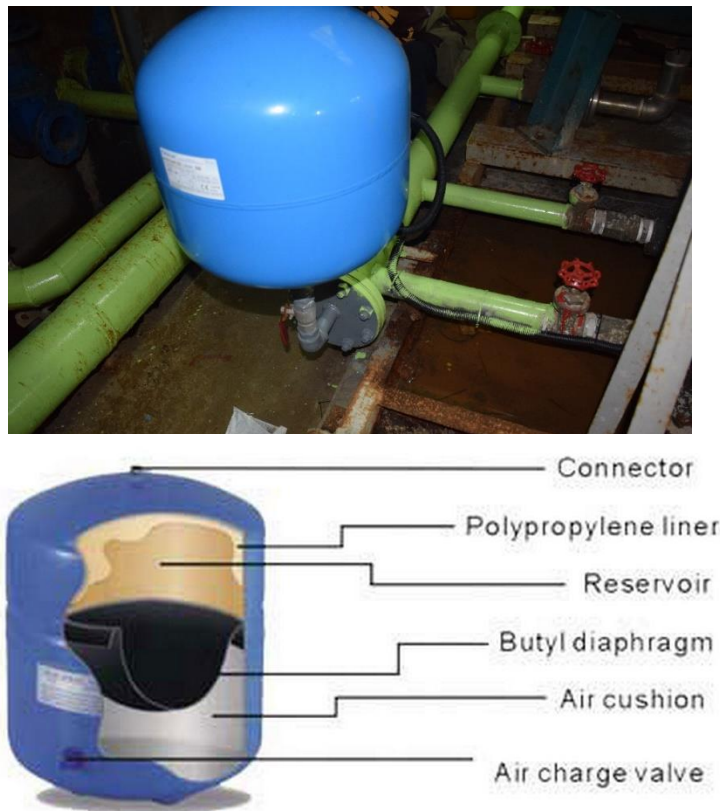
Section of pressure tank showing the mechanism.
